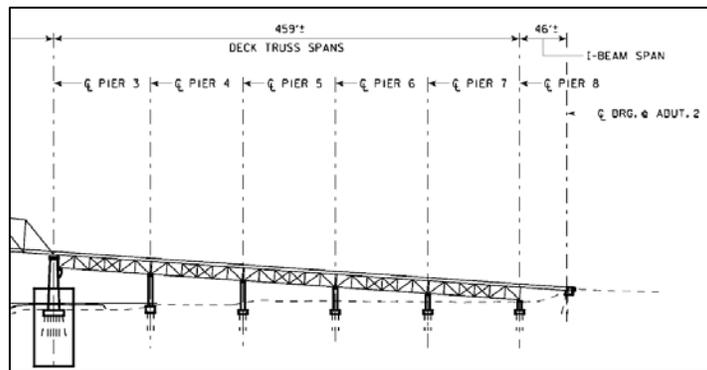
Diagram of south elevation of the east approach spans and east part of main structure.
